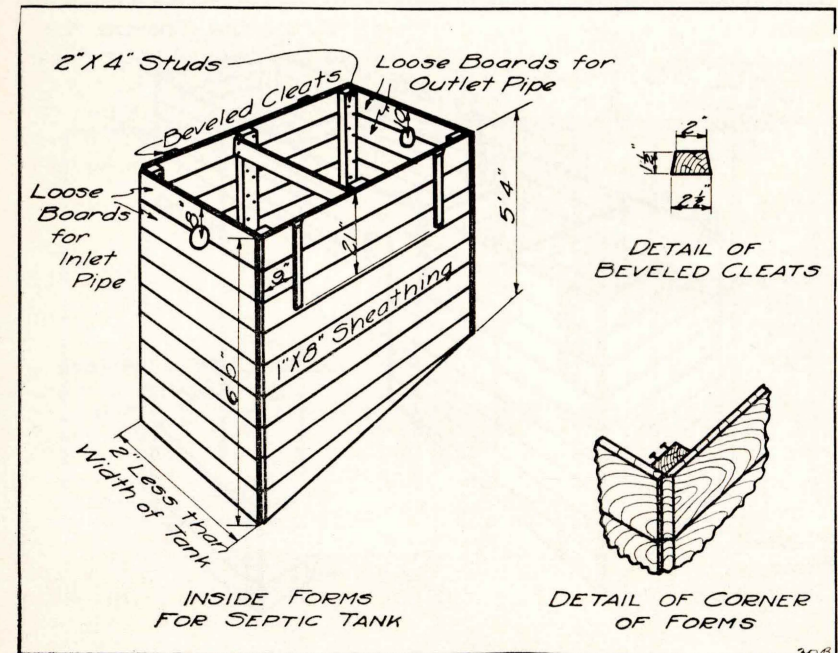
Form Details for Plant No. 1 Comprising a Single Chamber Septic Tank.
